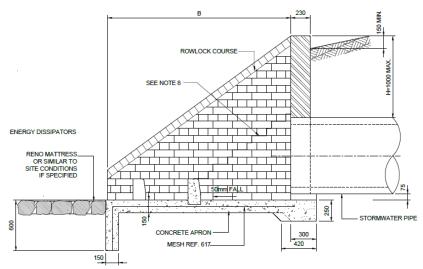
5 Typical Stormwater Headwall with Energy Dissipators
